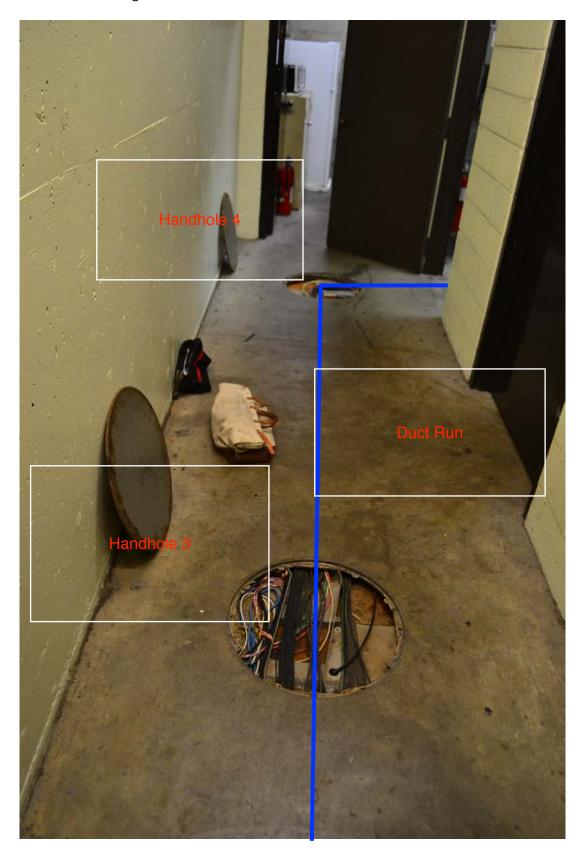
E09 College Park – Power duct run between Kiosk and Handhole 4 and Handhole 5
